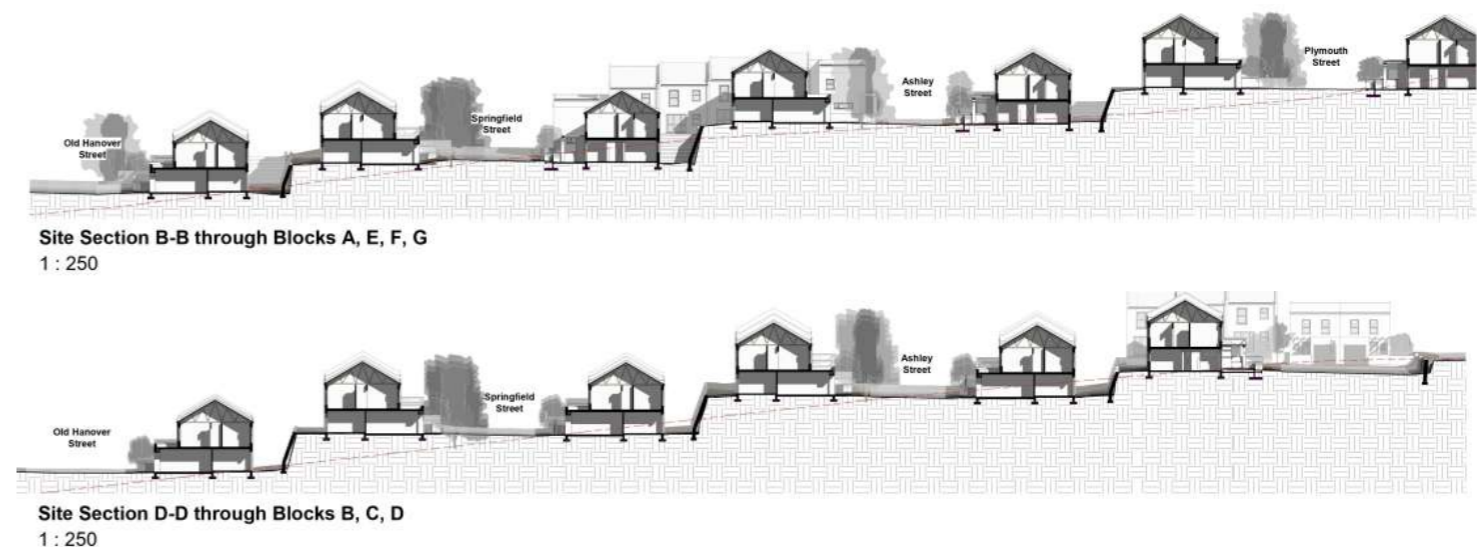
North-south cross sections through Erf 177646 showing the extensive cut and fill required to accommodate the platforms for construction (D6-ADE JV, 2022).
